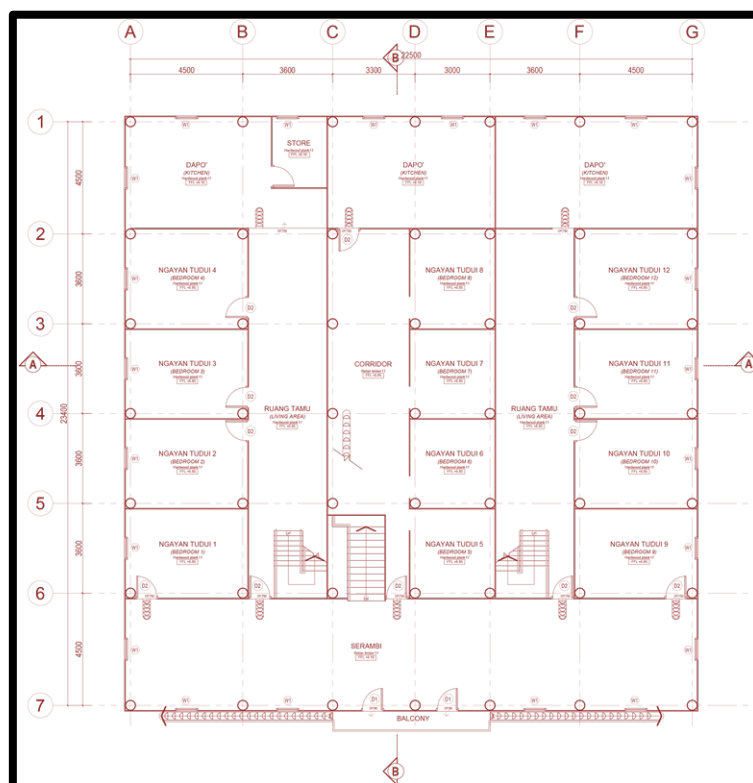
The Melanau Tall Longhouse, Main Level Floor Plan
